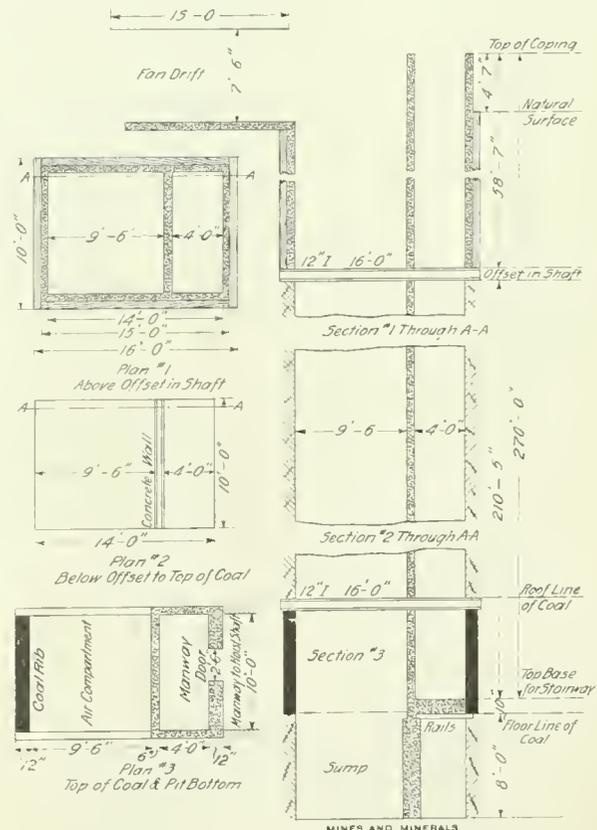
PLANS AND LONGITUDINAL SECTIONS OF AIR SHAFT
